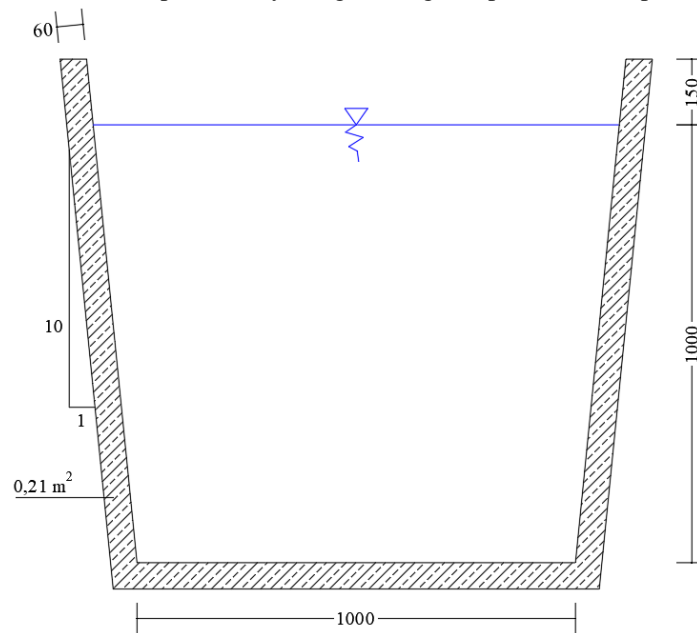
Model of Open Drainage Channel (dimensions in mm)
